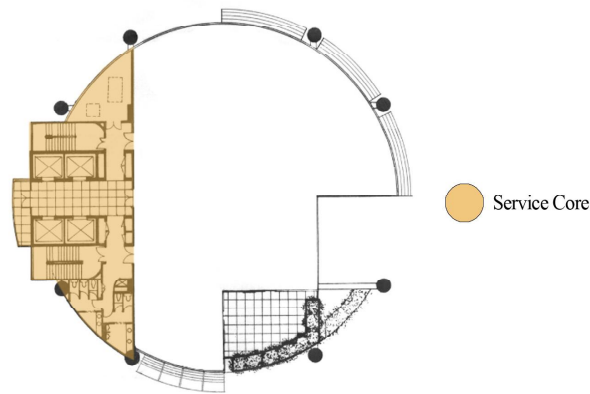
Menara Mesiniaga, floor plan (Hamzah & Yeang, 2015)
